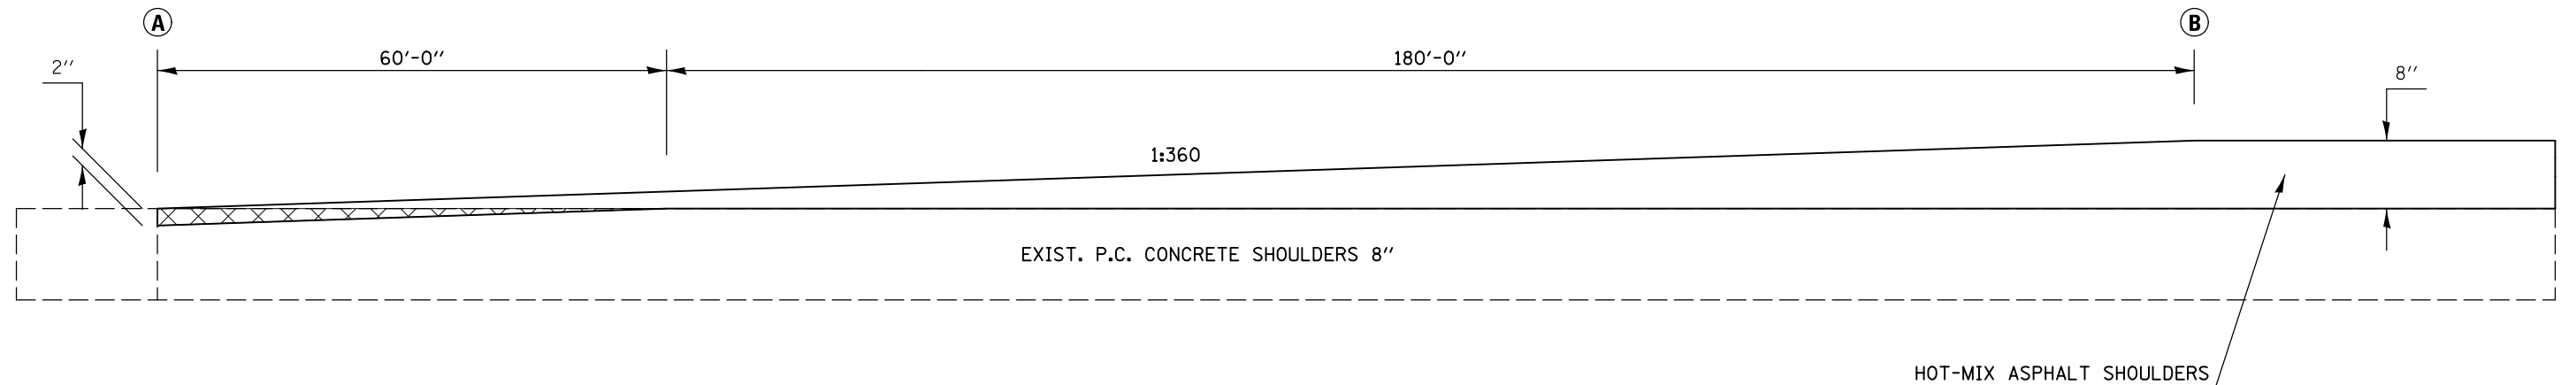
BUTT JOINTS AND PAVING TRANSITIONS
